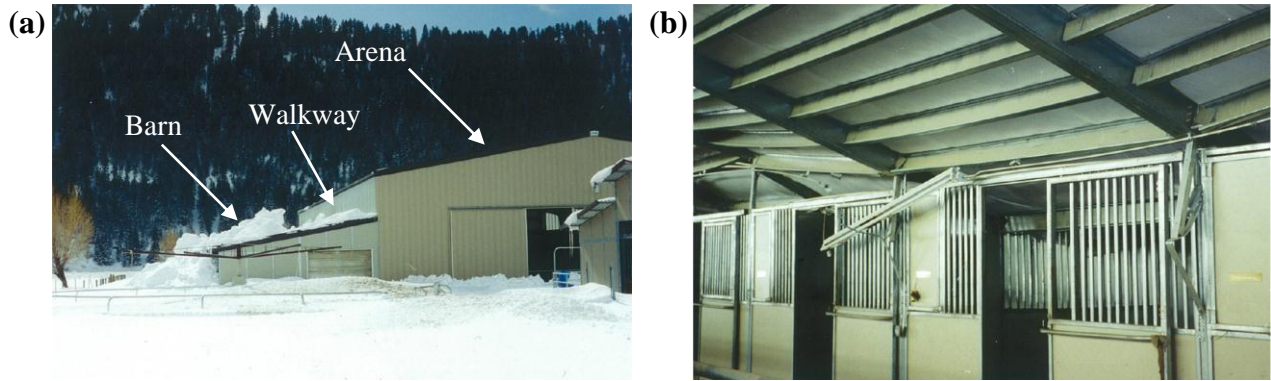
(a) Roof and snow drifting profile and (b) roof after failure (J.R. Harris & Co. 2011).
